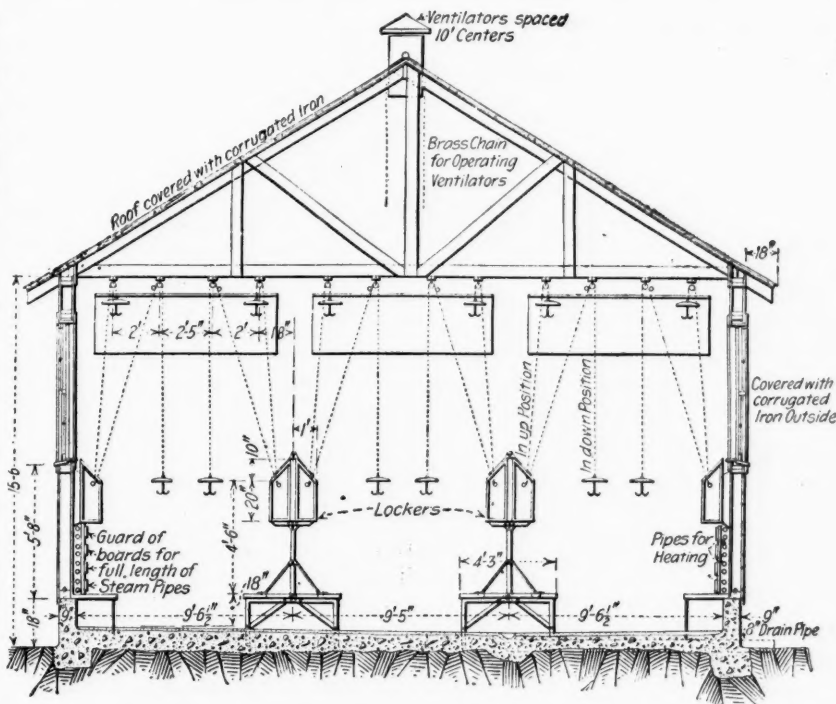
TRANSVERSE SECTION OF THE WASHHOUSE
